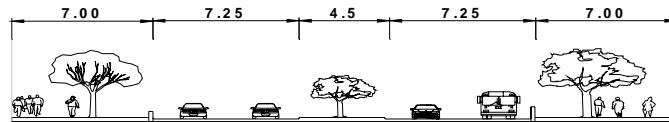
TYPICAL CROSS SECTION OF NMT FACILITIES WITH LANDSCAPING
